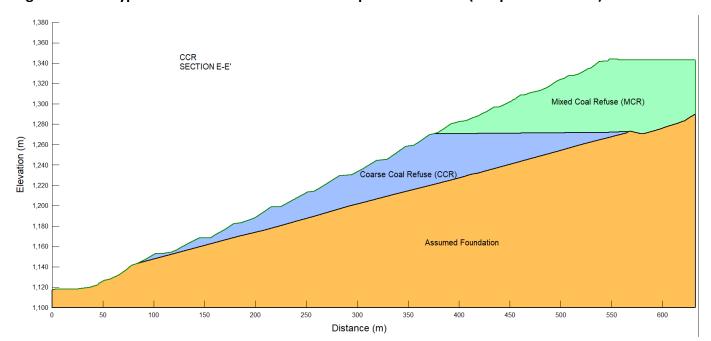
Typical Cross-Section of the CCR Dump at Section E-E' (Adapted from EVO).
